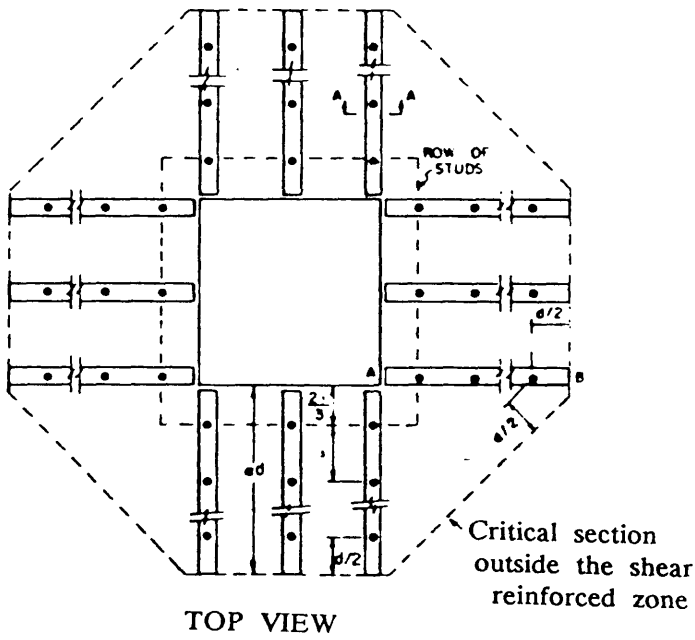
Typical arrangement of shear studs in Cal-gary tests⁽³⁴⁾
